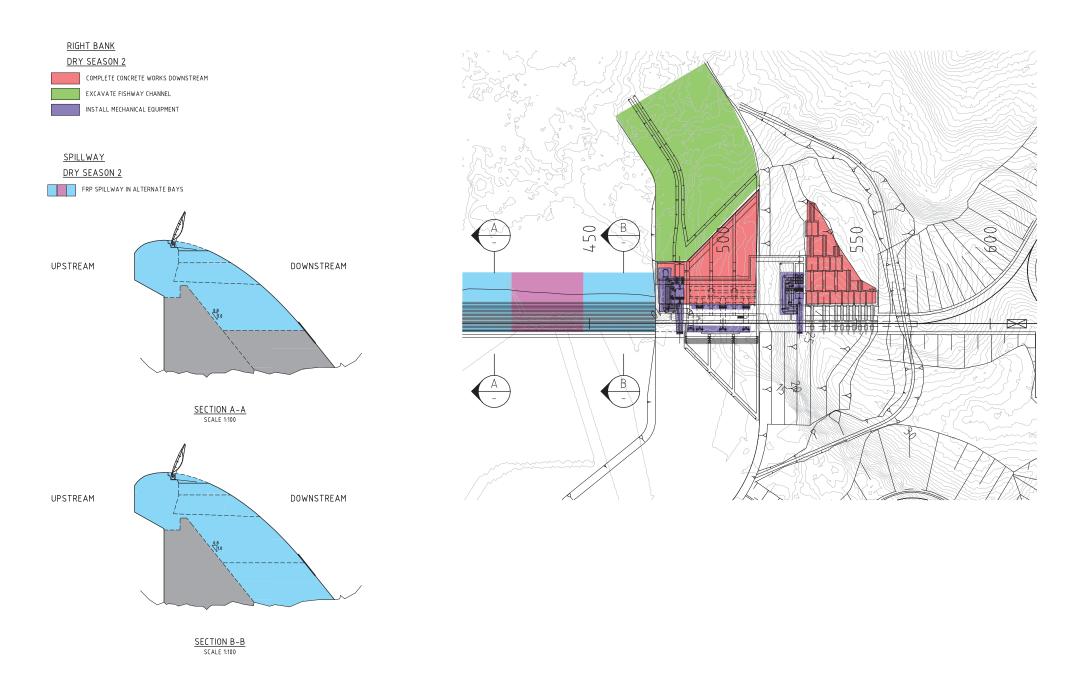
Eden Bann Weir construction sequencing (Sheet 3 of 4)
